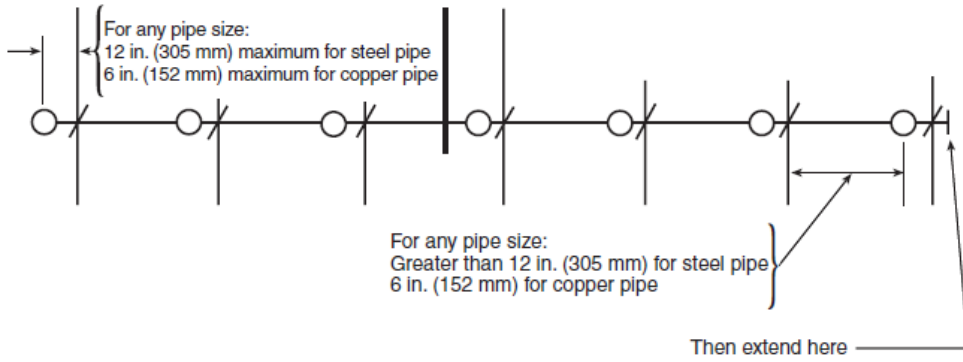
(a) Distance from Sprinkler to Hanger Where Maximum Pressure Exceeds 100 psi (6.9 bar) and Branch Line Above Ceiling Supplies Pendent Sprinklers Below Ceiling.
